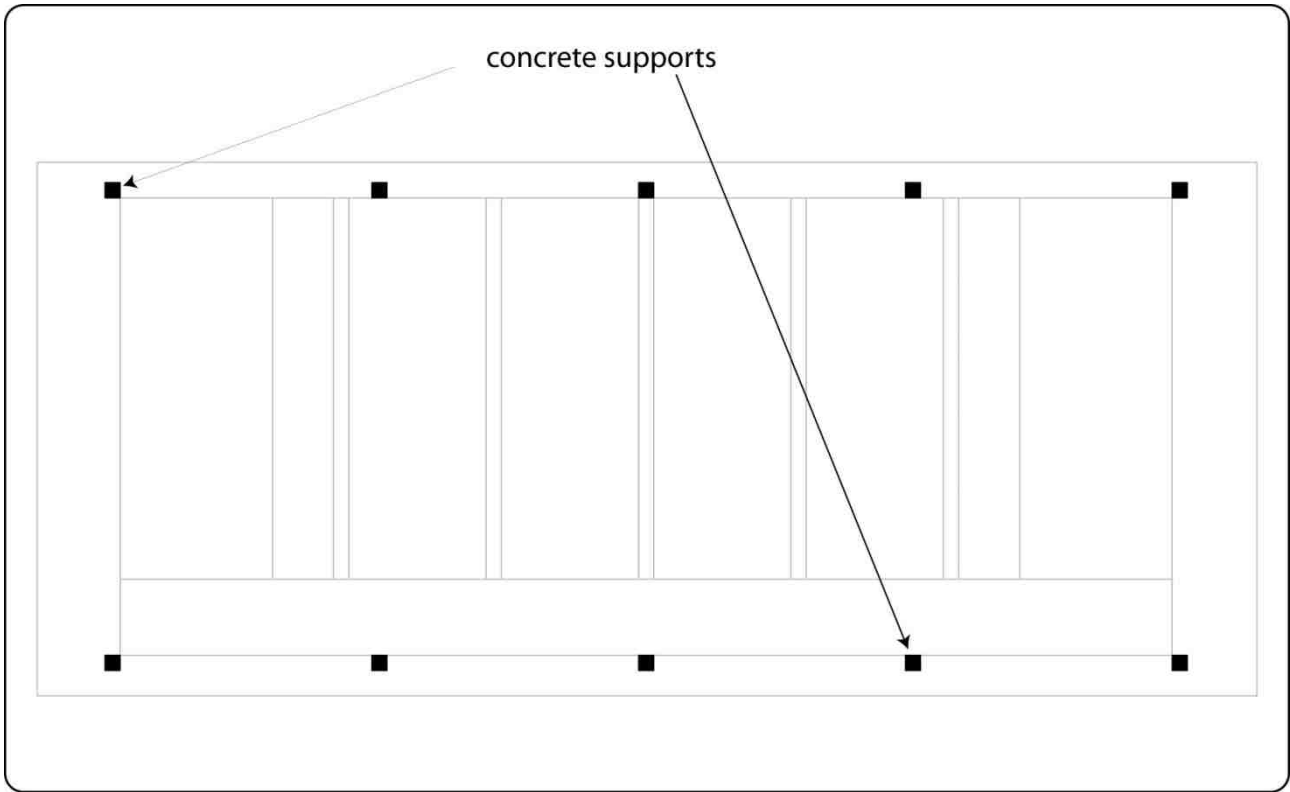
first phase is to plant the concrete support. It is necessary to dig a hole to house the support, than it's necessary to plant it vertical and check for verticality with levels.
